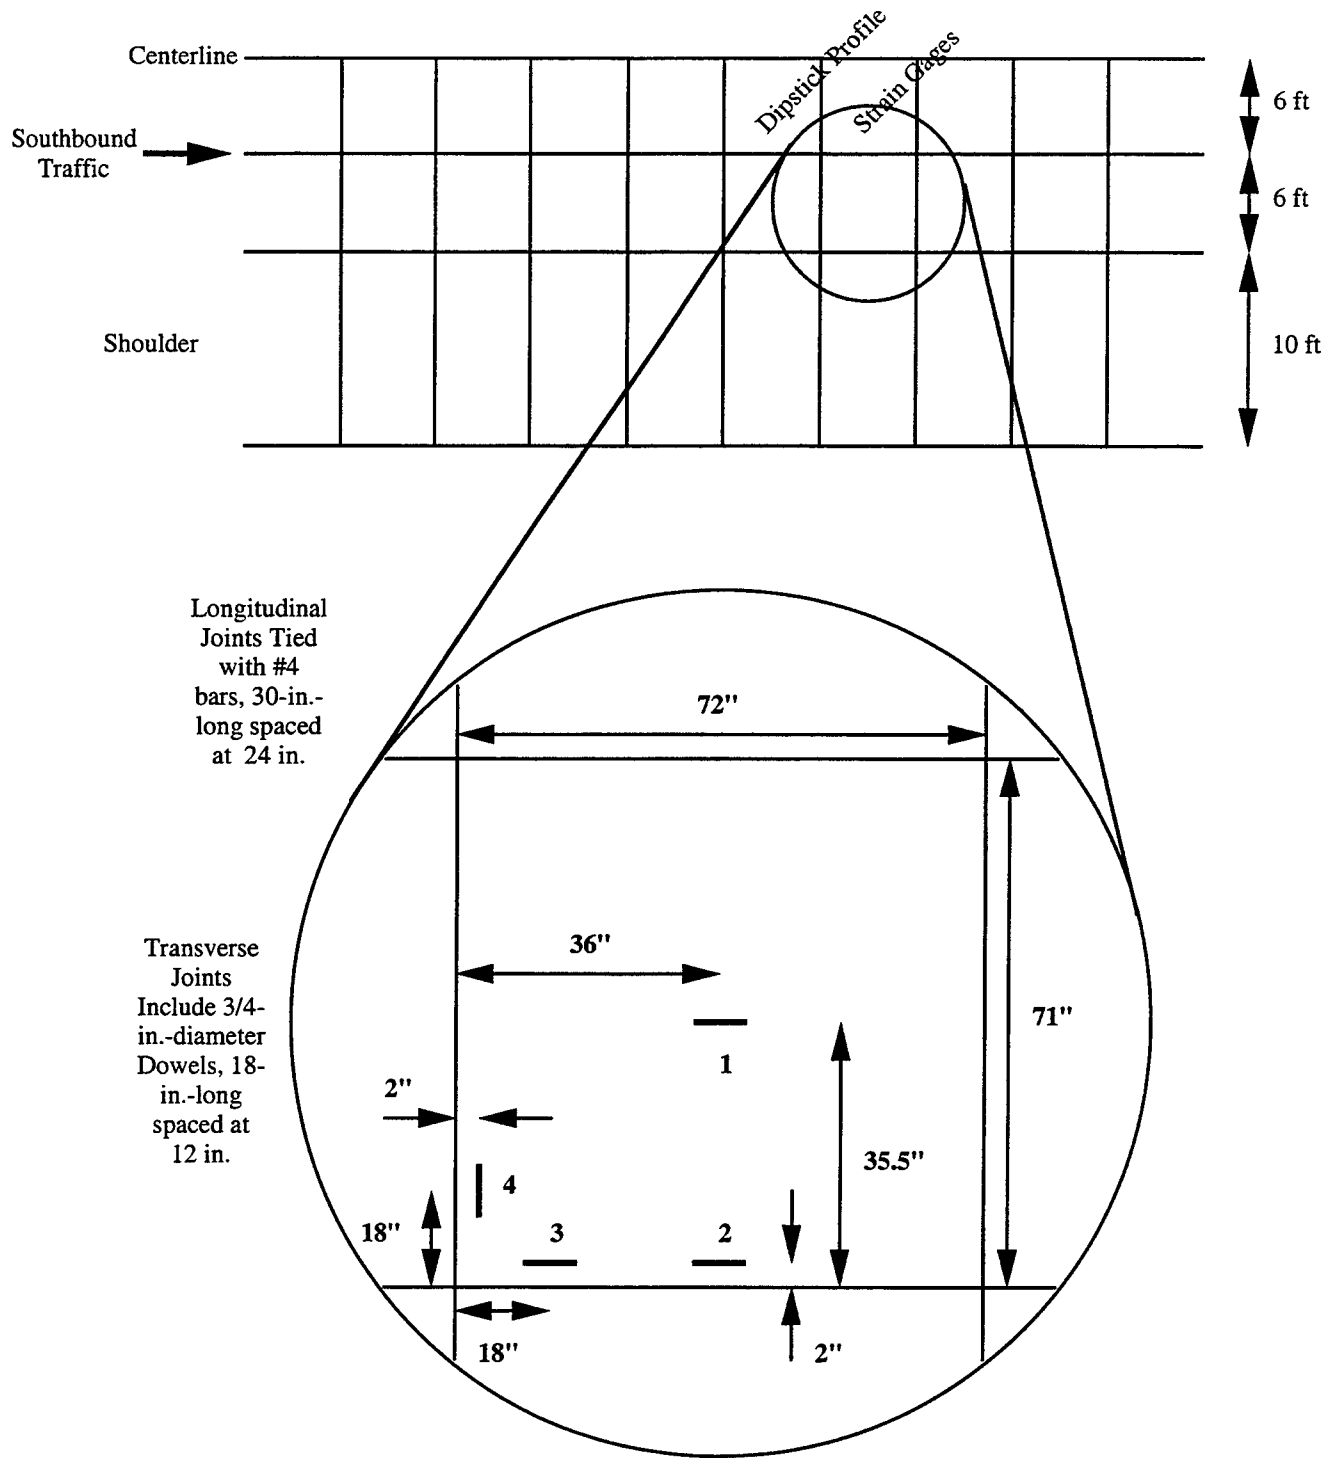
Test Slab E Layout for CDOT Project #3.
